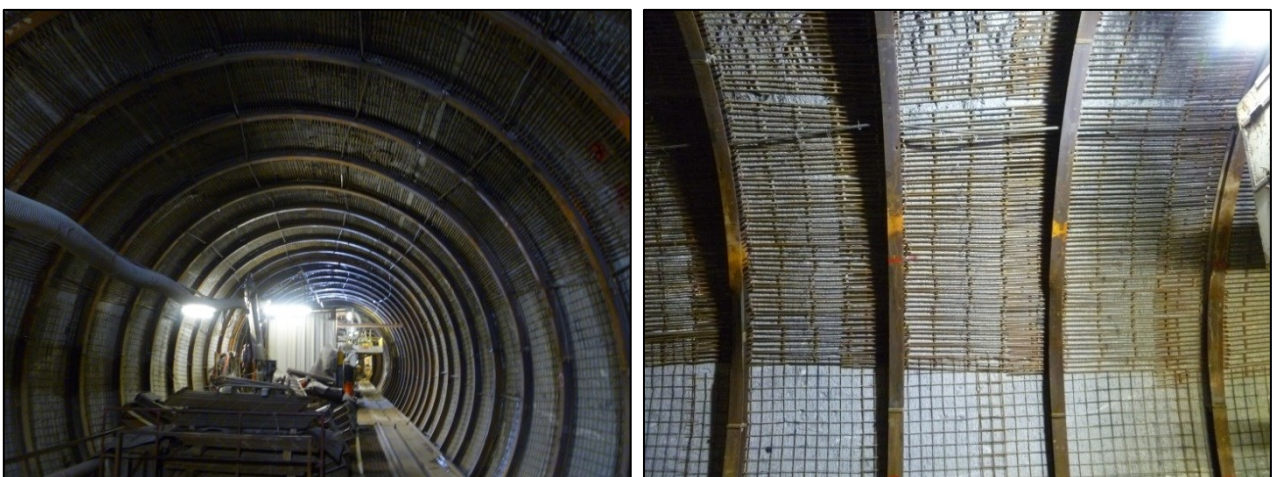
FMV section. On the left, tract of tunnel where FMV section has been installed; on the right, detail of this section utilization.
